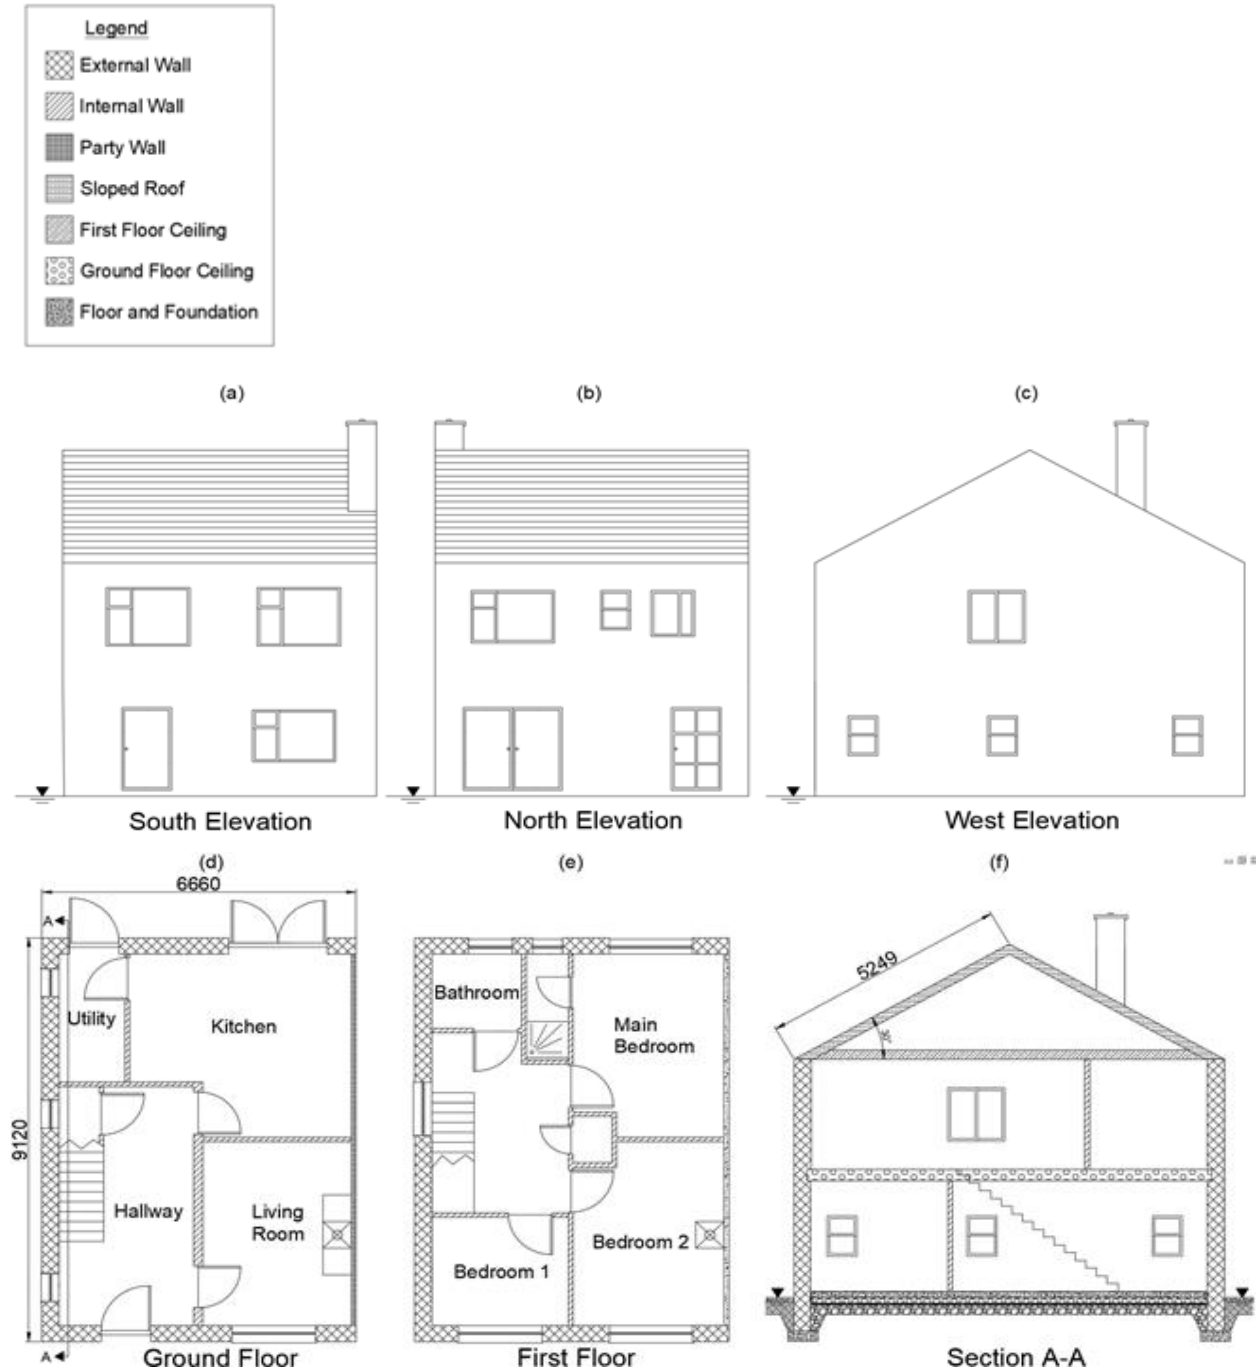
Plans for a 3-bedroom semi-detached house a) Front Elevation, (b) Back Elevation, (c) End Elevation, (d) Ground Floor, (e) First Floor, and (f) Cross Section view.
